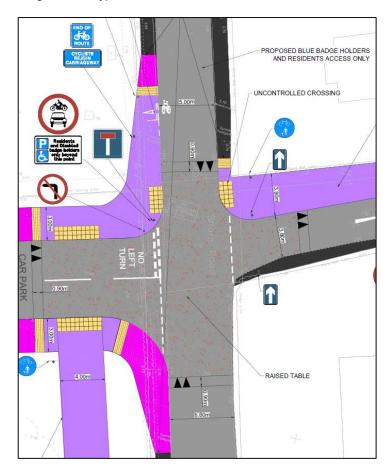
Shore Road Access North of Proposed Car Park Junction
